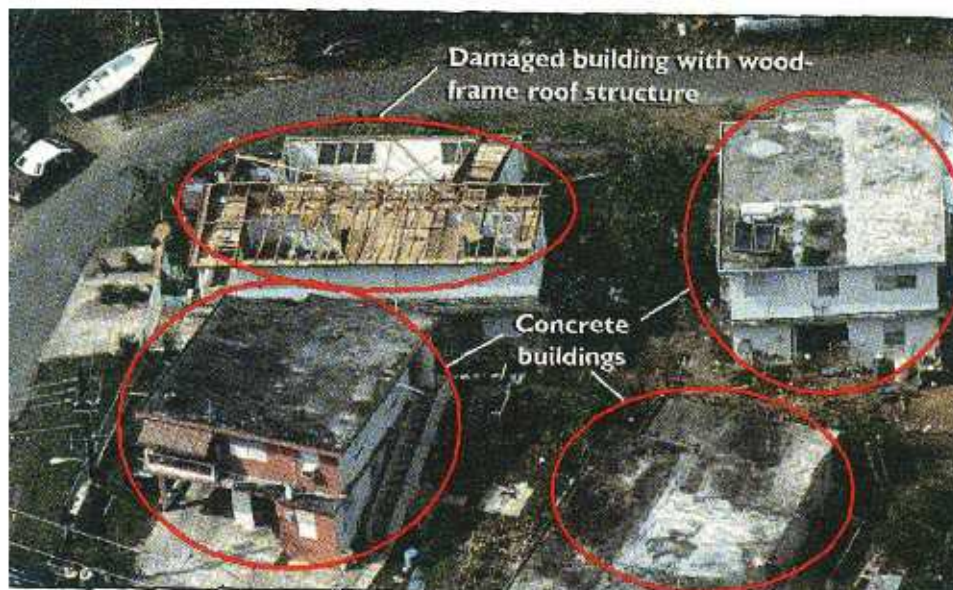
The three concrete/masonry buildings in this photo appeared to be undamaged. However, the building with the wood-frame roof structure experienced significant damage.
